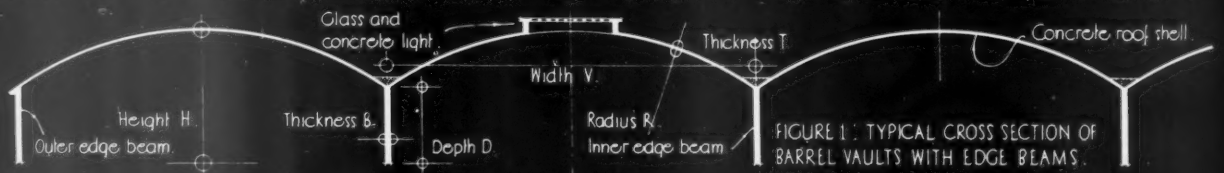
TYPICAL CROSS SECTION OF BARREL VAULTS WITH EDGE BEAMS.
